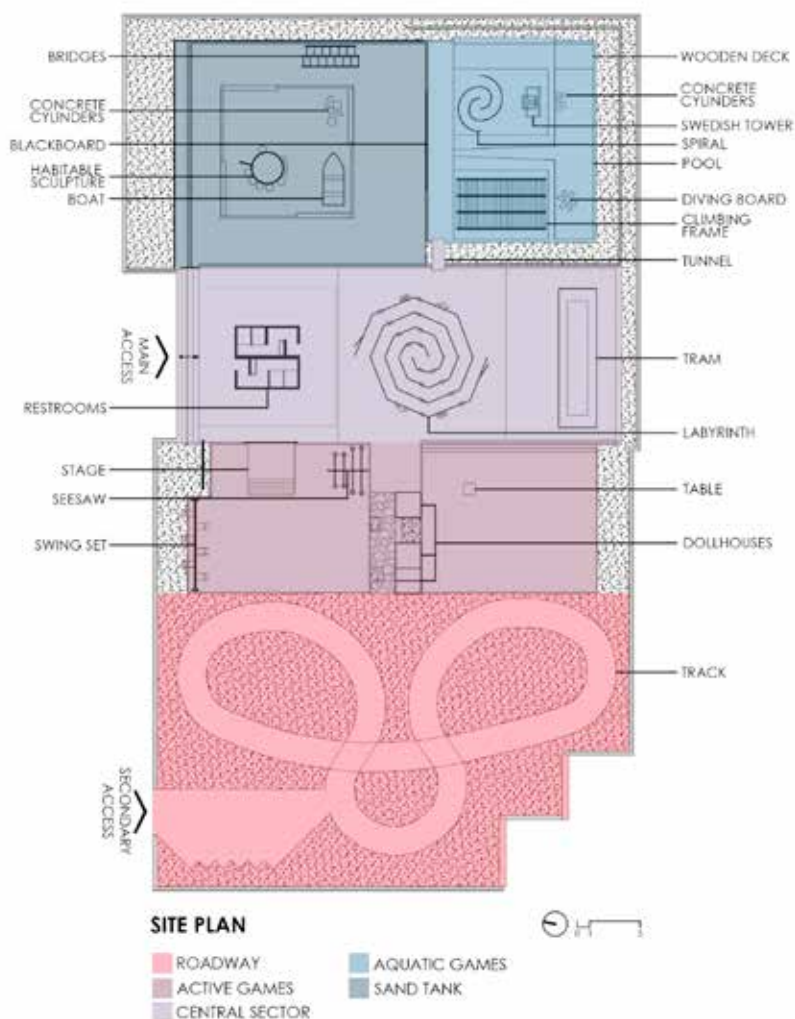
Site plan drawn from Clube Esperia's ground plans.
